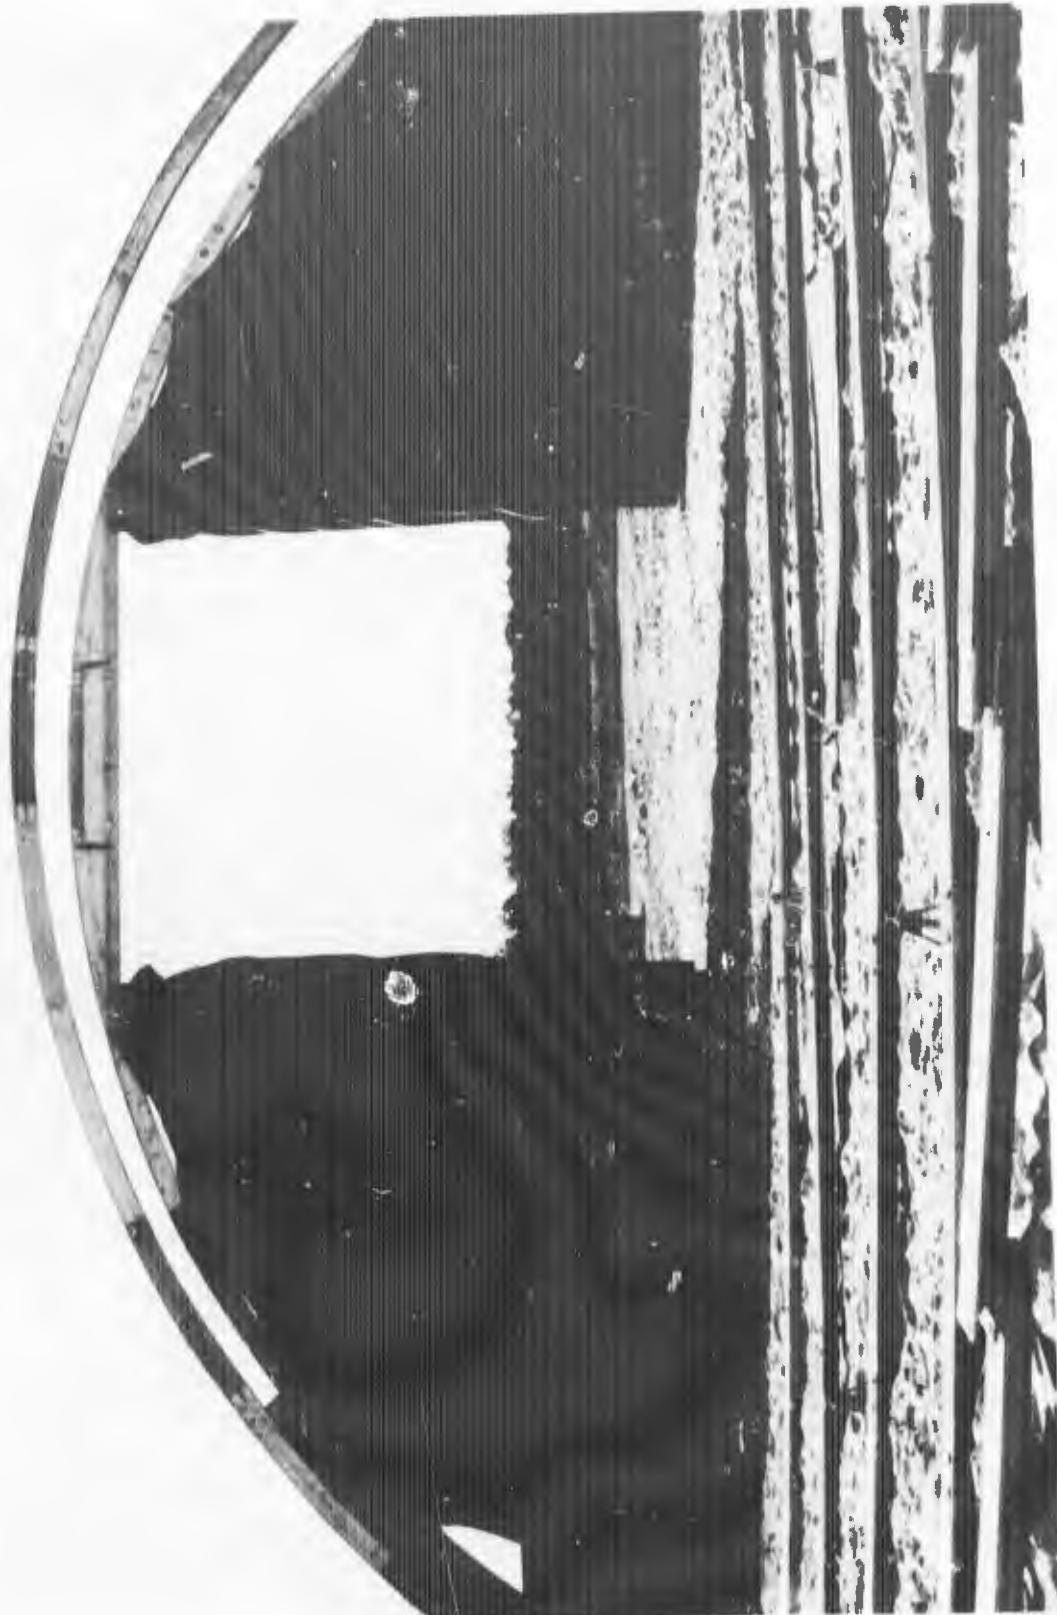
Fabric Door in Truck Entry Position with Arch Beams in the Foreground
